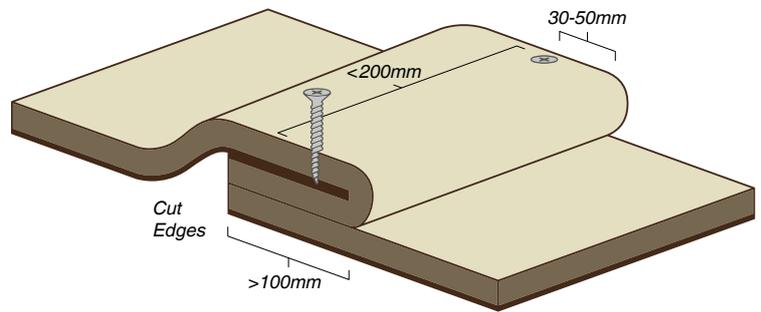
Screwed Knuckle Joint for Cut Edges of CC
